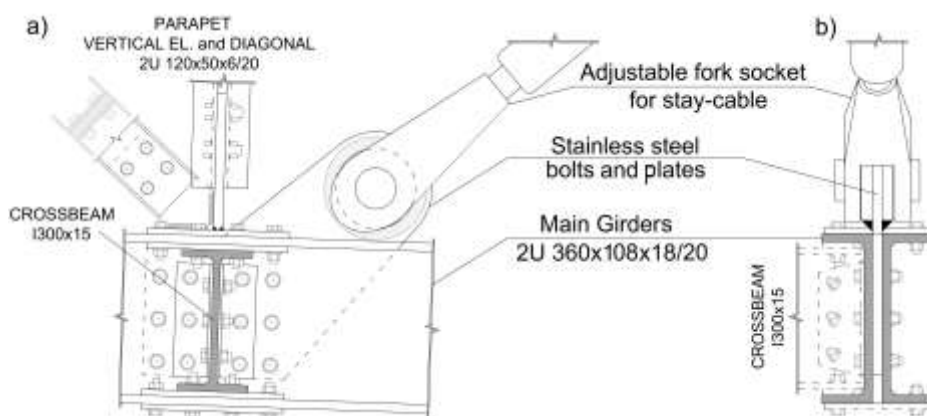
Detail of the connection between stay-cables and main girders: (a) lateral view; (b) cross section.
